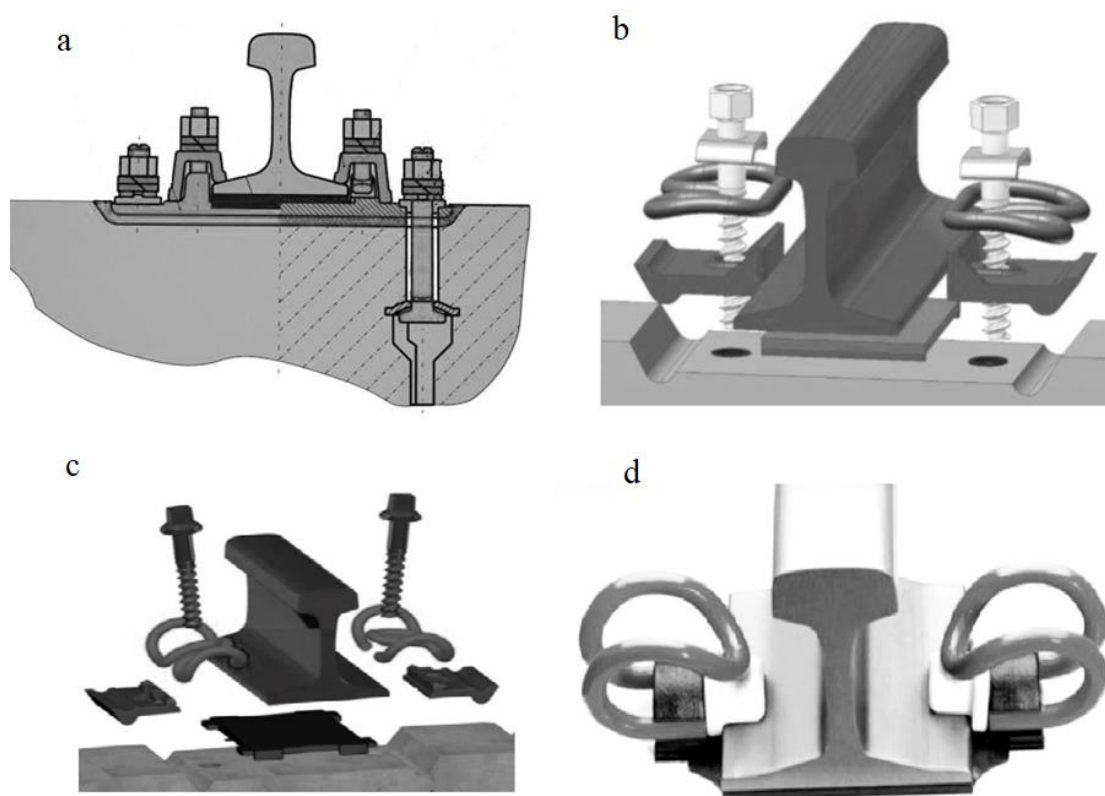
Structural configurations of the principal rail fastening systems installed on reinforced-concrete sleepers in the JSC «NC KTZ» network: (a) KB-65; (b) ZhBR-65/ZhBR-65Sh; (c) SKL, GK1 systems; (d) KPP-5
